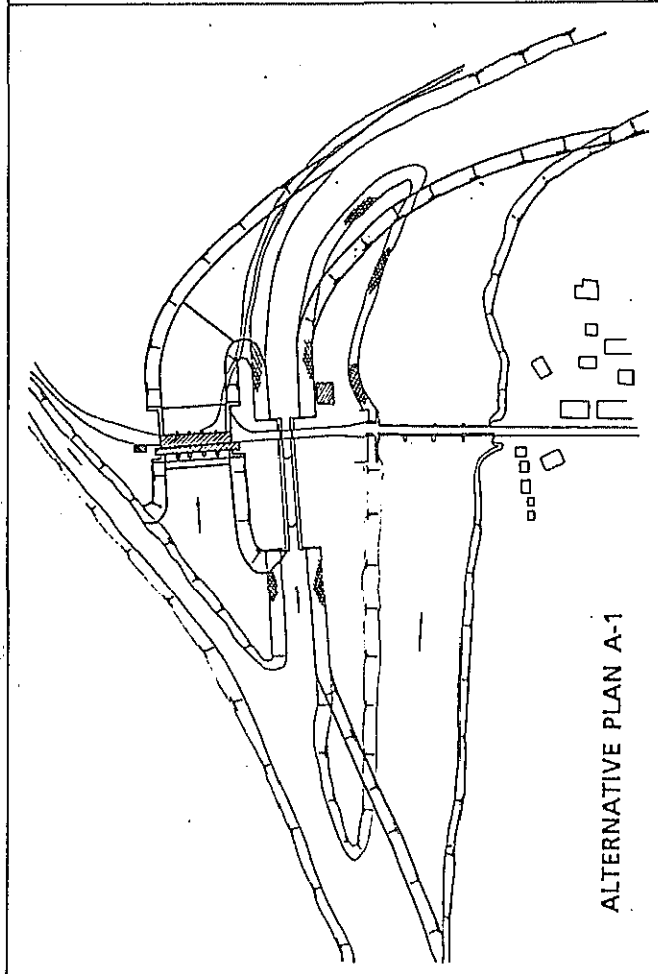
Alternative Plan of Proposed Site (Sakoula Regulator)
